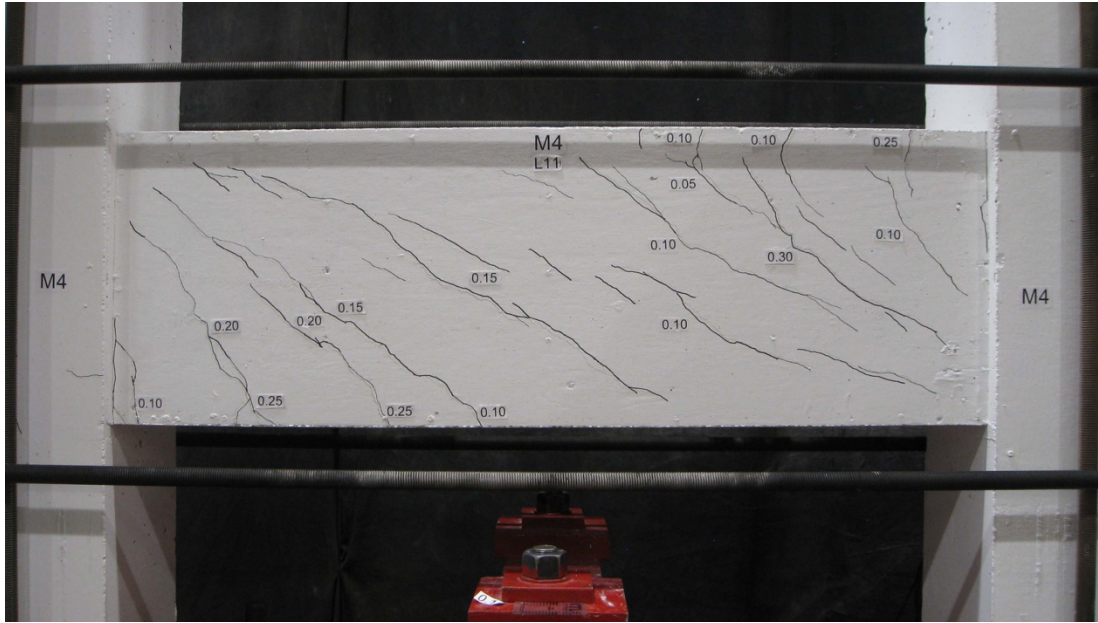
Crack pattern and width at shear of 417 kN for specimen M4
